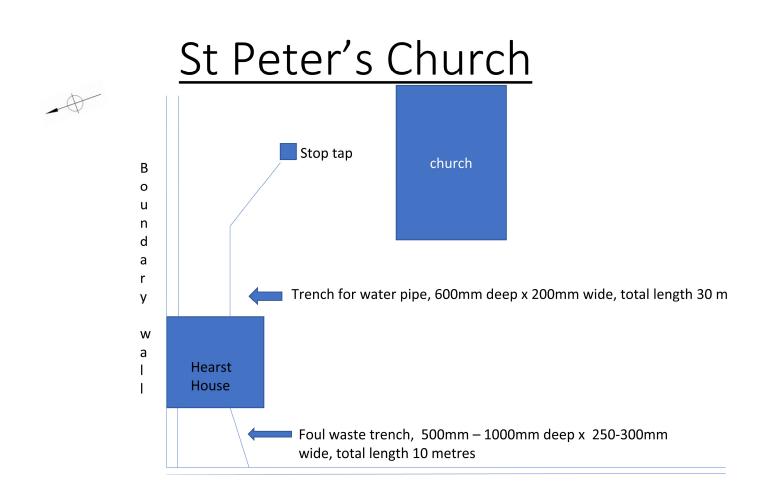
DEVELOPMENT PROPOSALS (sketch provided by Building Contractor - not to scale)
